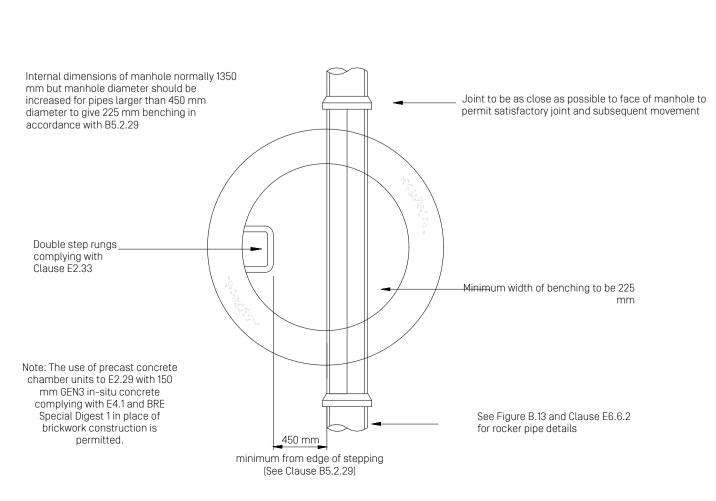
TYPICAL MANHOLE DETAIL - TYPE C Depth from cover level to soffit of pipe less than 1.5 m maximum pipe size 450 mm diameter rigid material construction Not to scale
